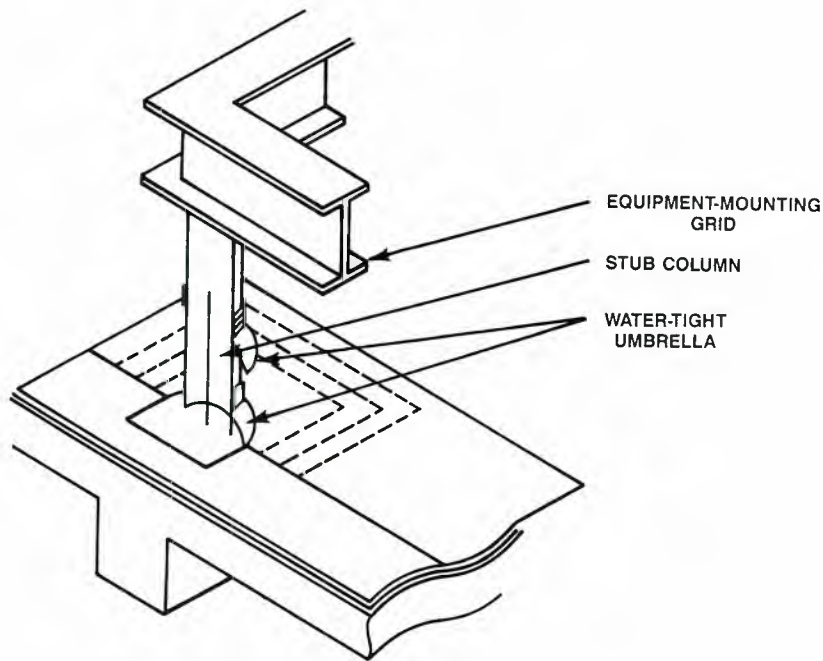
An equipment-mounting grid allows future flexibility of roof-mounted equipment, without requiring future puncturing of the roof membrane, which can lead to water damage.
